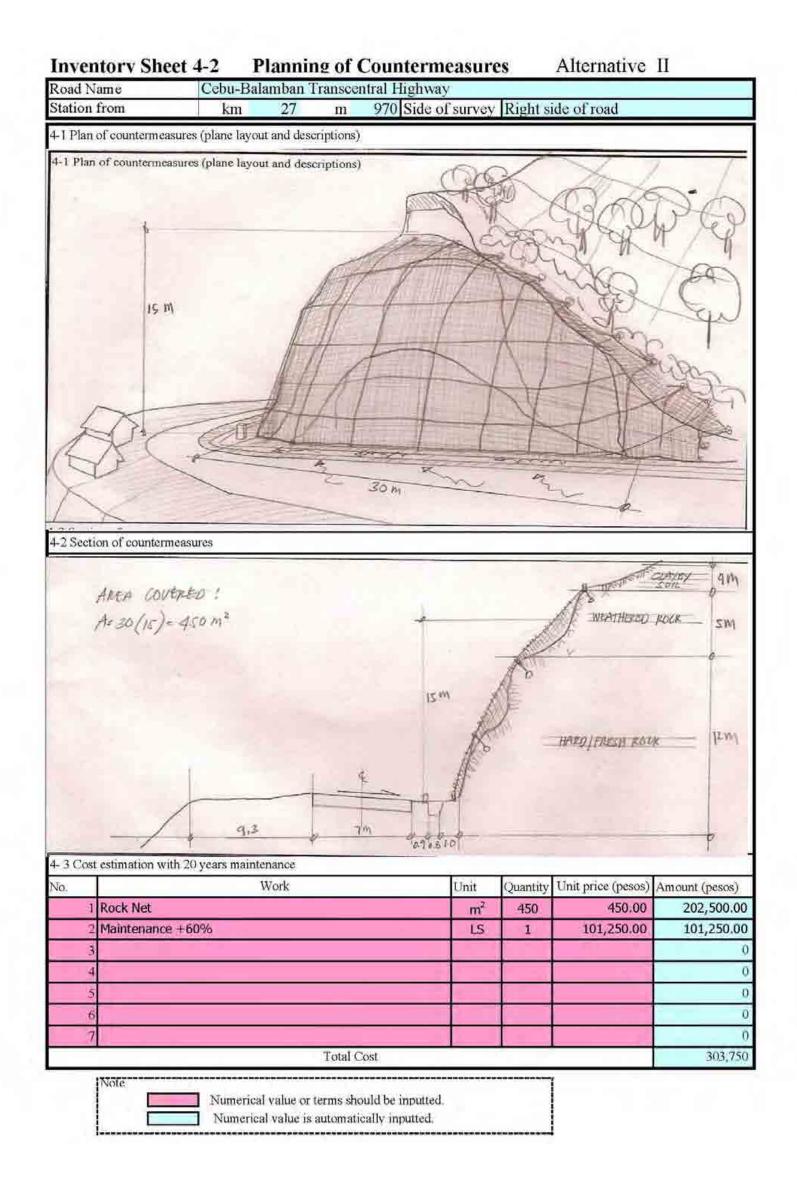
Example of Inventory Sheet 4-2: Planning of Countermeasure Alternative II for Rock Slope Collapse
